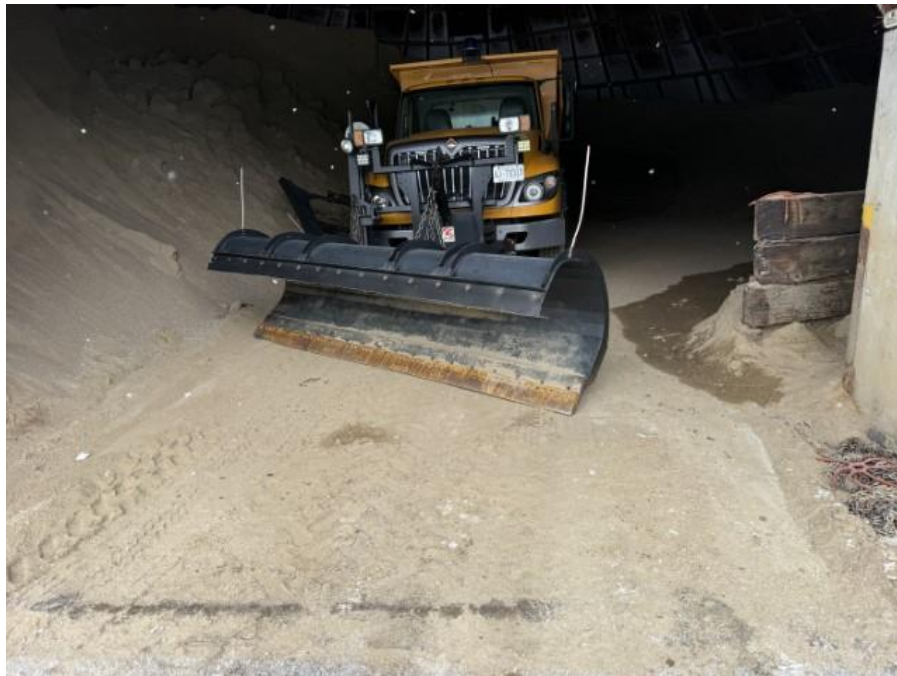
Sand Dome – Overview of Slab-on-Grade Condition
